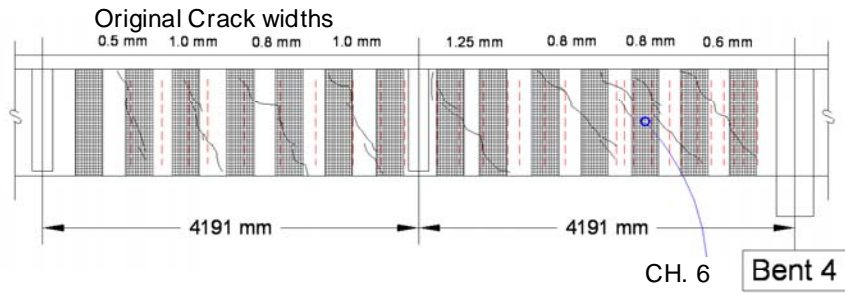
Field measured cracking, embedded stirrups, and externally bonded CFRP on exterior girder.
